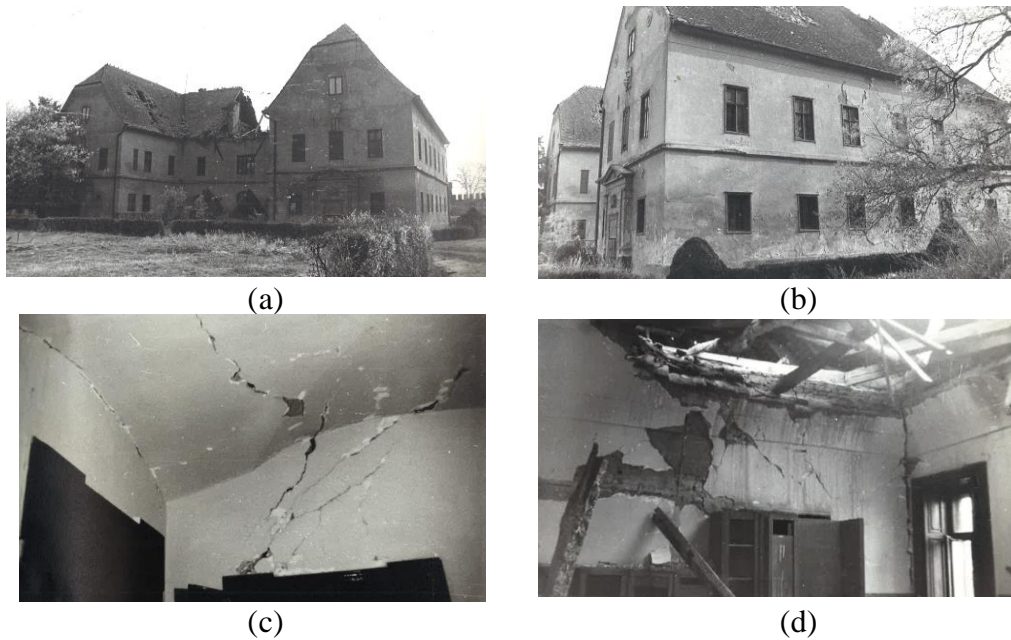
Detected damages on the Banloc Castle after the 1991 earthquake: (a) North façade; (b) West façade; (c) first floor room; (d) second floor room [16]
